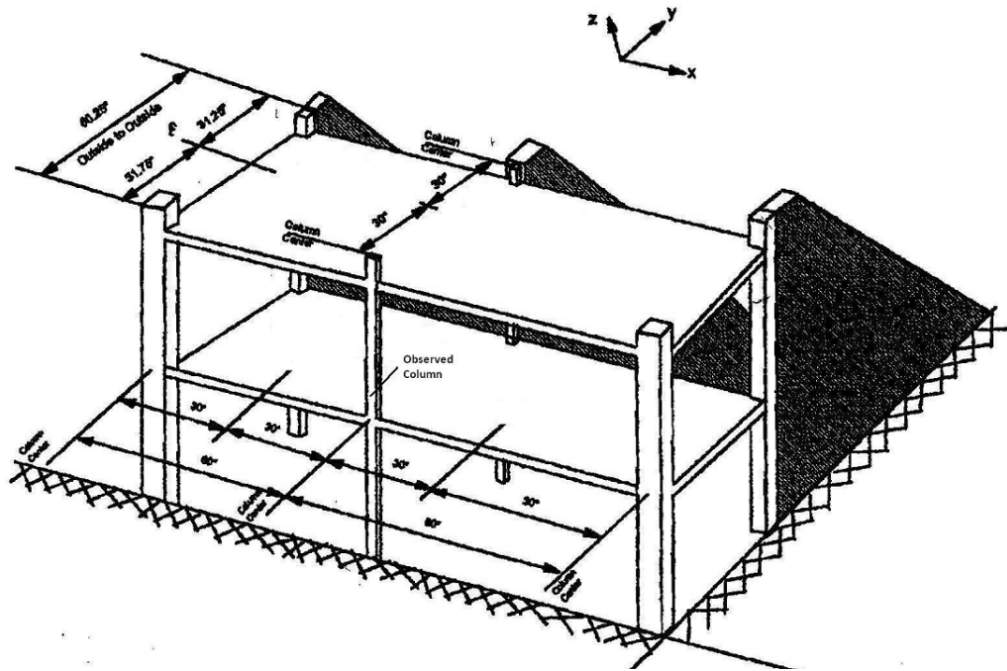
Layout of open RC frames quarter scale model (Woodson and Baylot, 1999)
